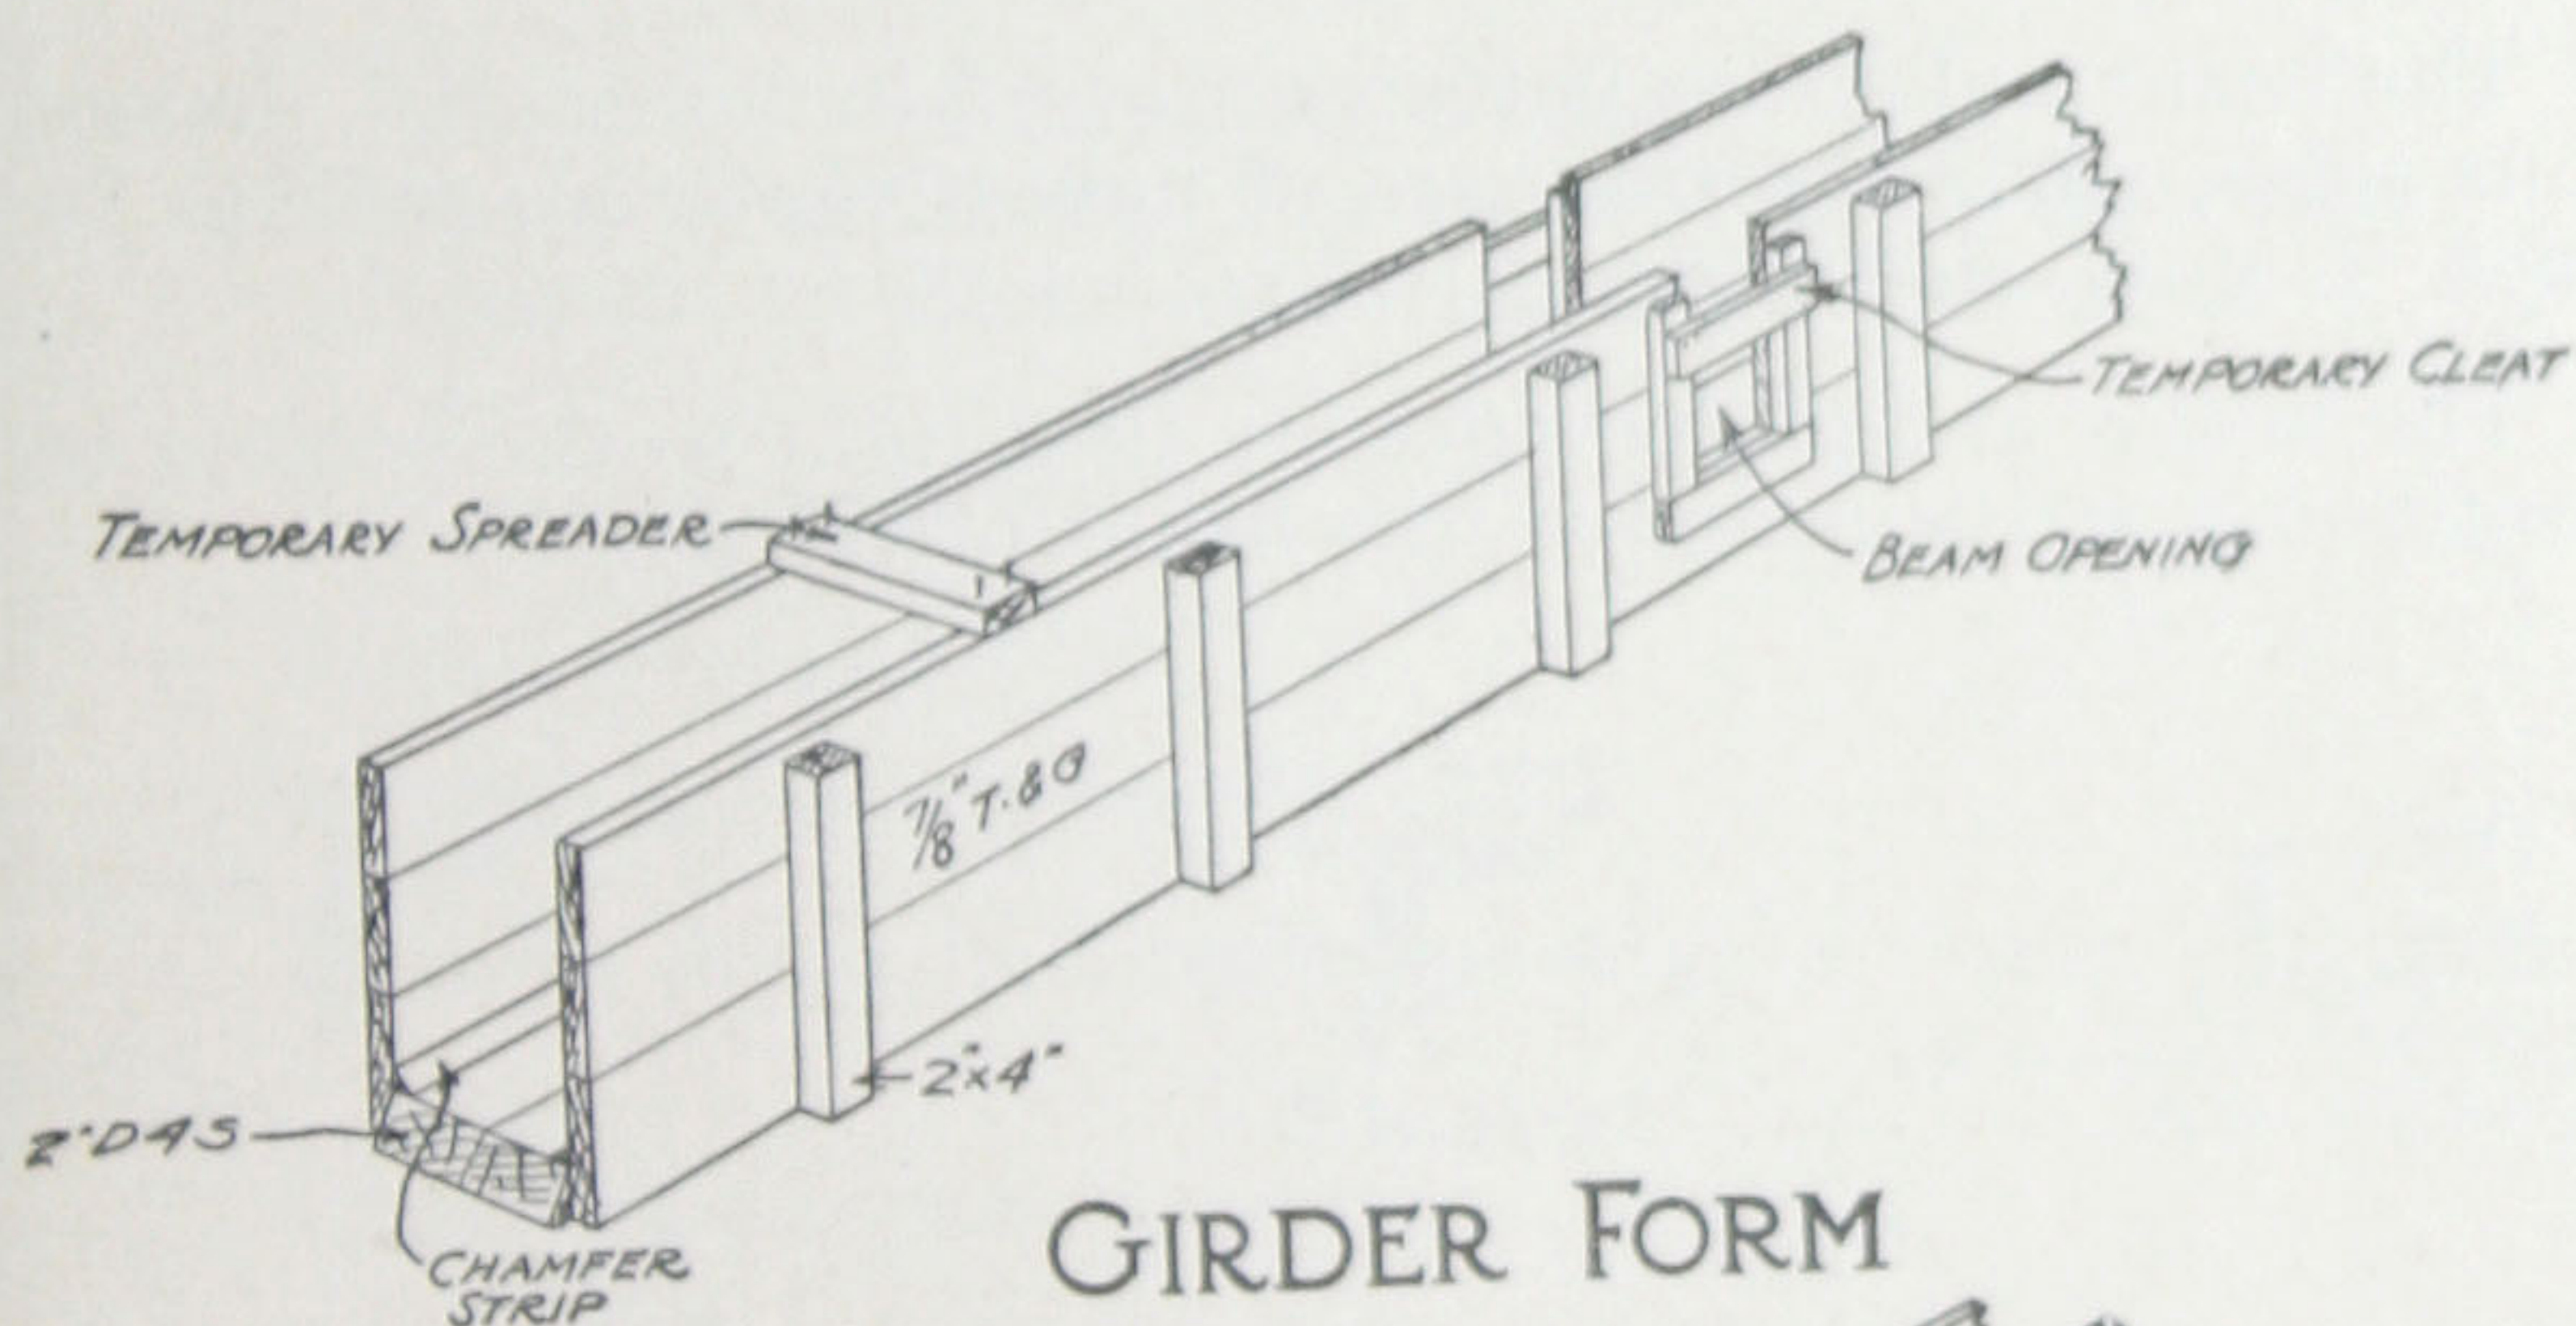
Beam and girder forms which are to be removed so that girder and beam bottoms remain in place on posts after sides are removed.
